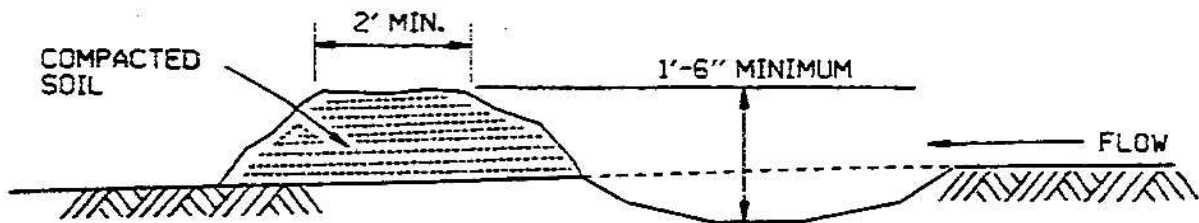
Swale configuration detail (Source: AHTD, 2001)
